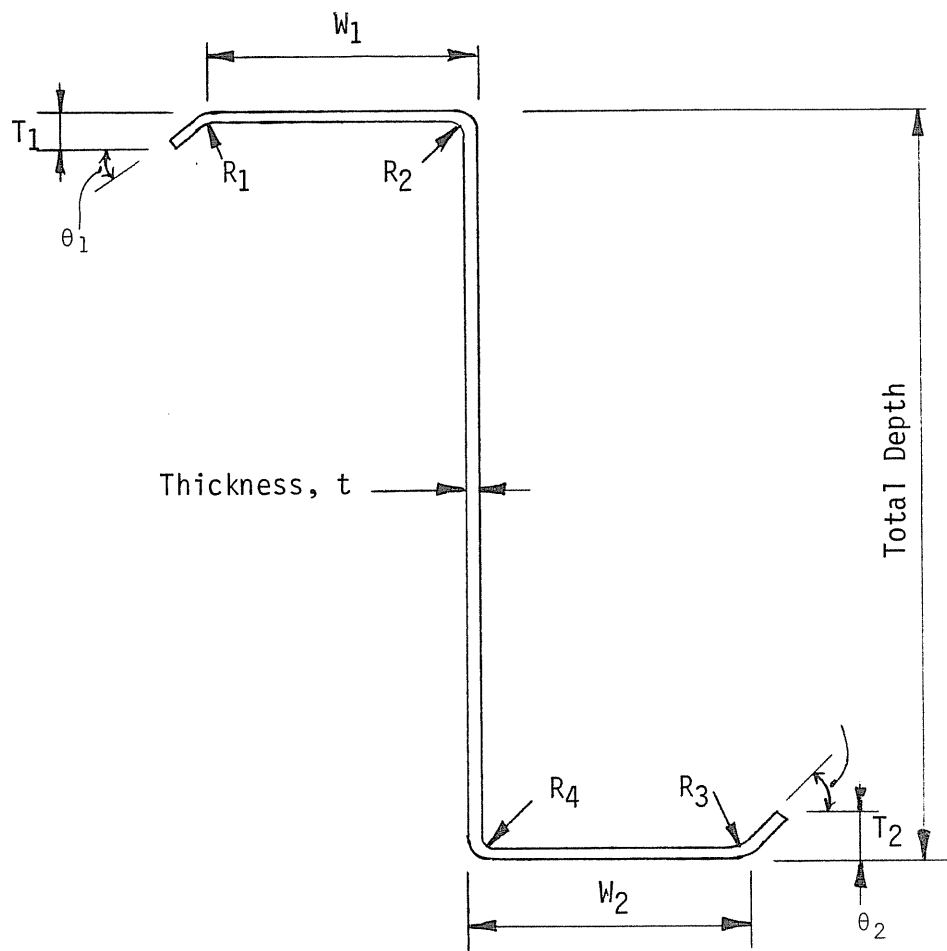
Purlin Cross-Section and Geometric Parameter
